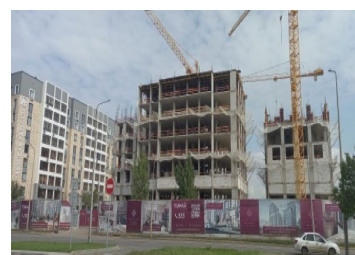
Instead of the initially planned 9 floors, according to the DPP, a residential complex with 9-16 storeys will be constructed
